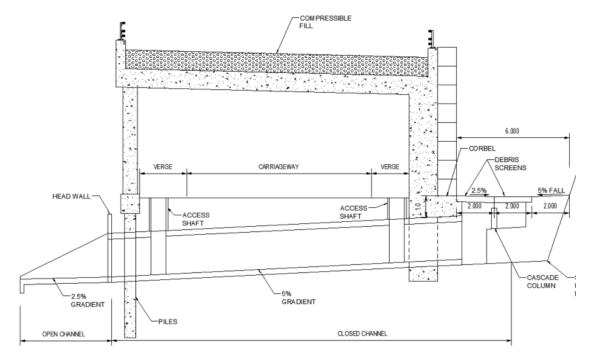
Indicative Drawing of Debris Flow Shelter Crossing
